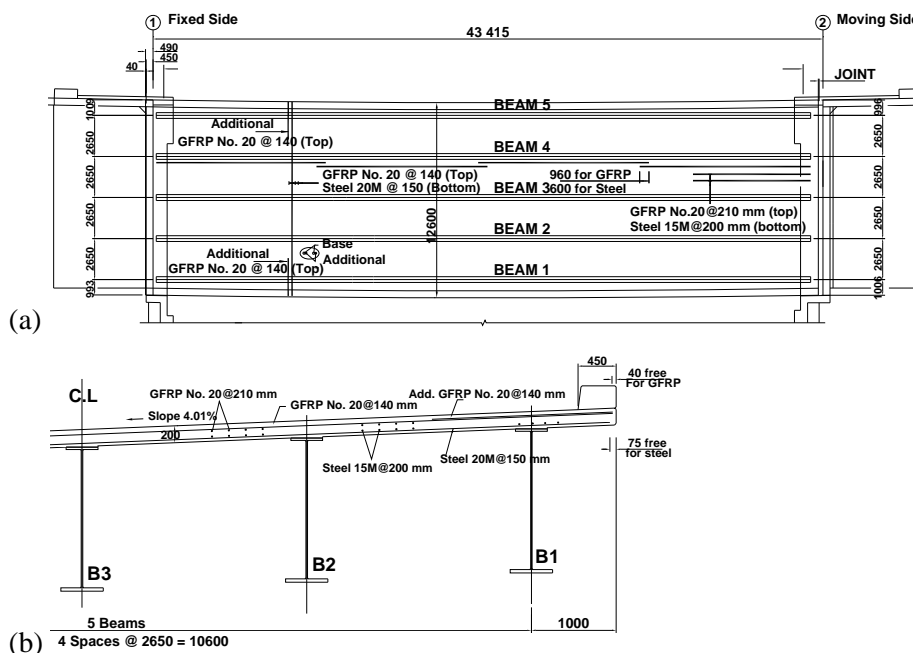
Geometry and reinforcement details: (a) plan view; (b) cross-section.
